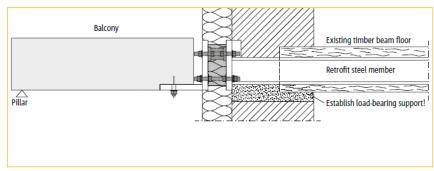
Balcony supported, connected with type KST on timber beam floor (concrete prefabricated component)
